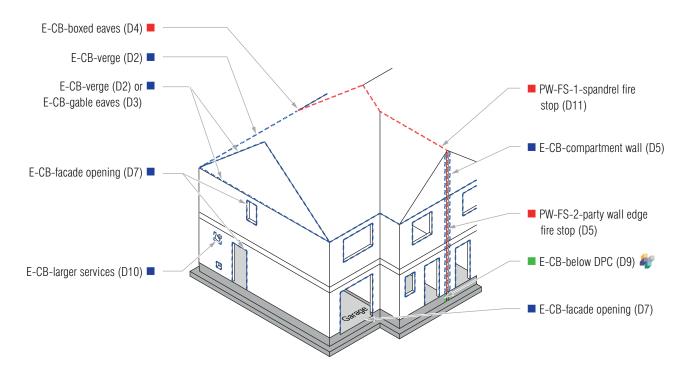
External weather facade to structural timber frame¹ e cavity barrier locations²; single dwelling England and Wales guidance⁵ compliance
